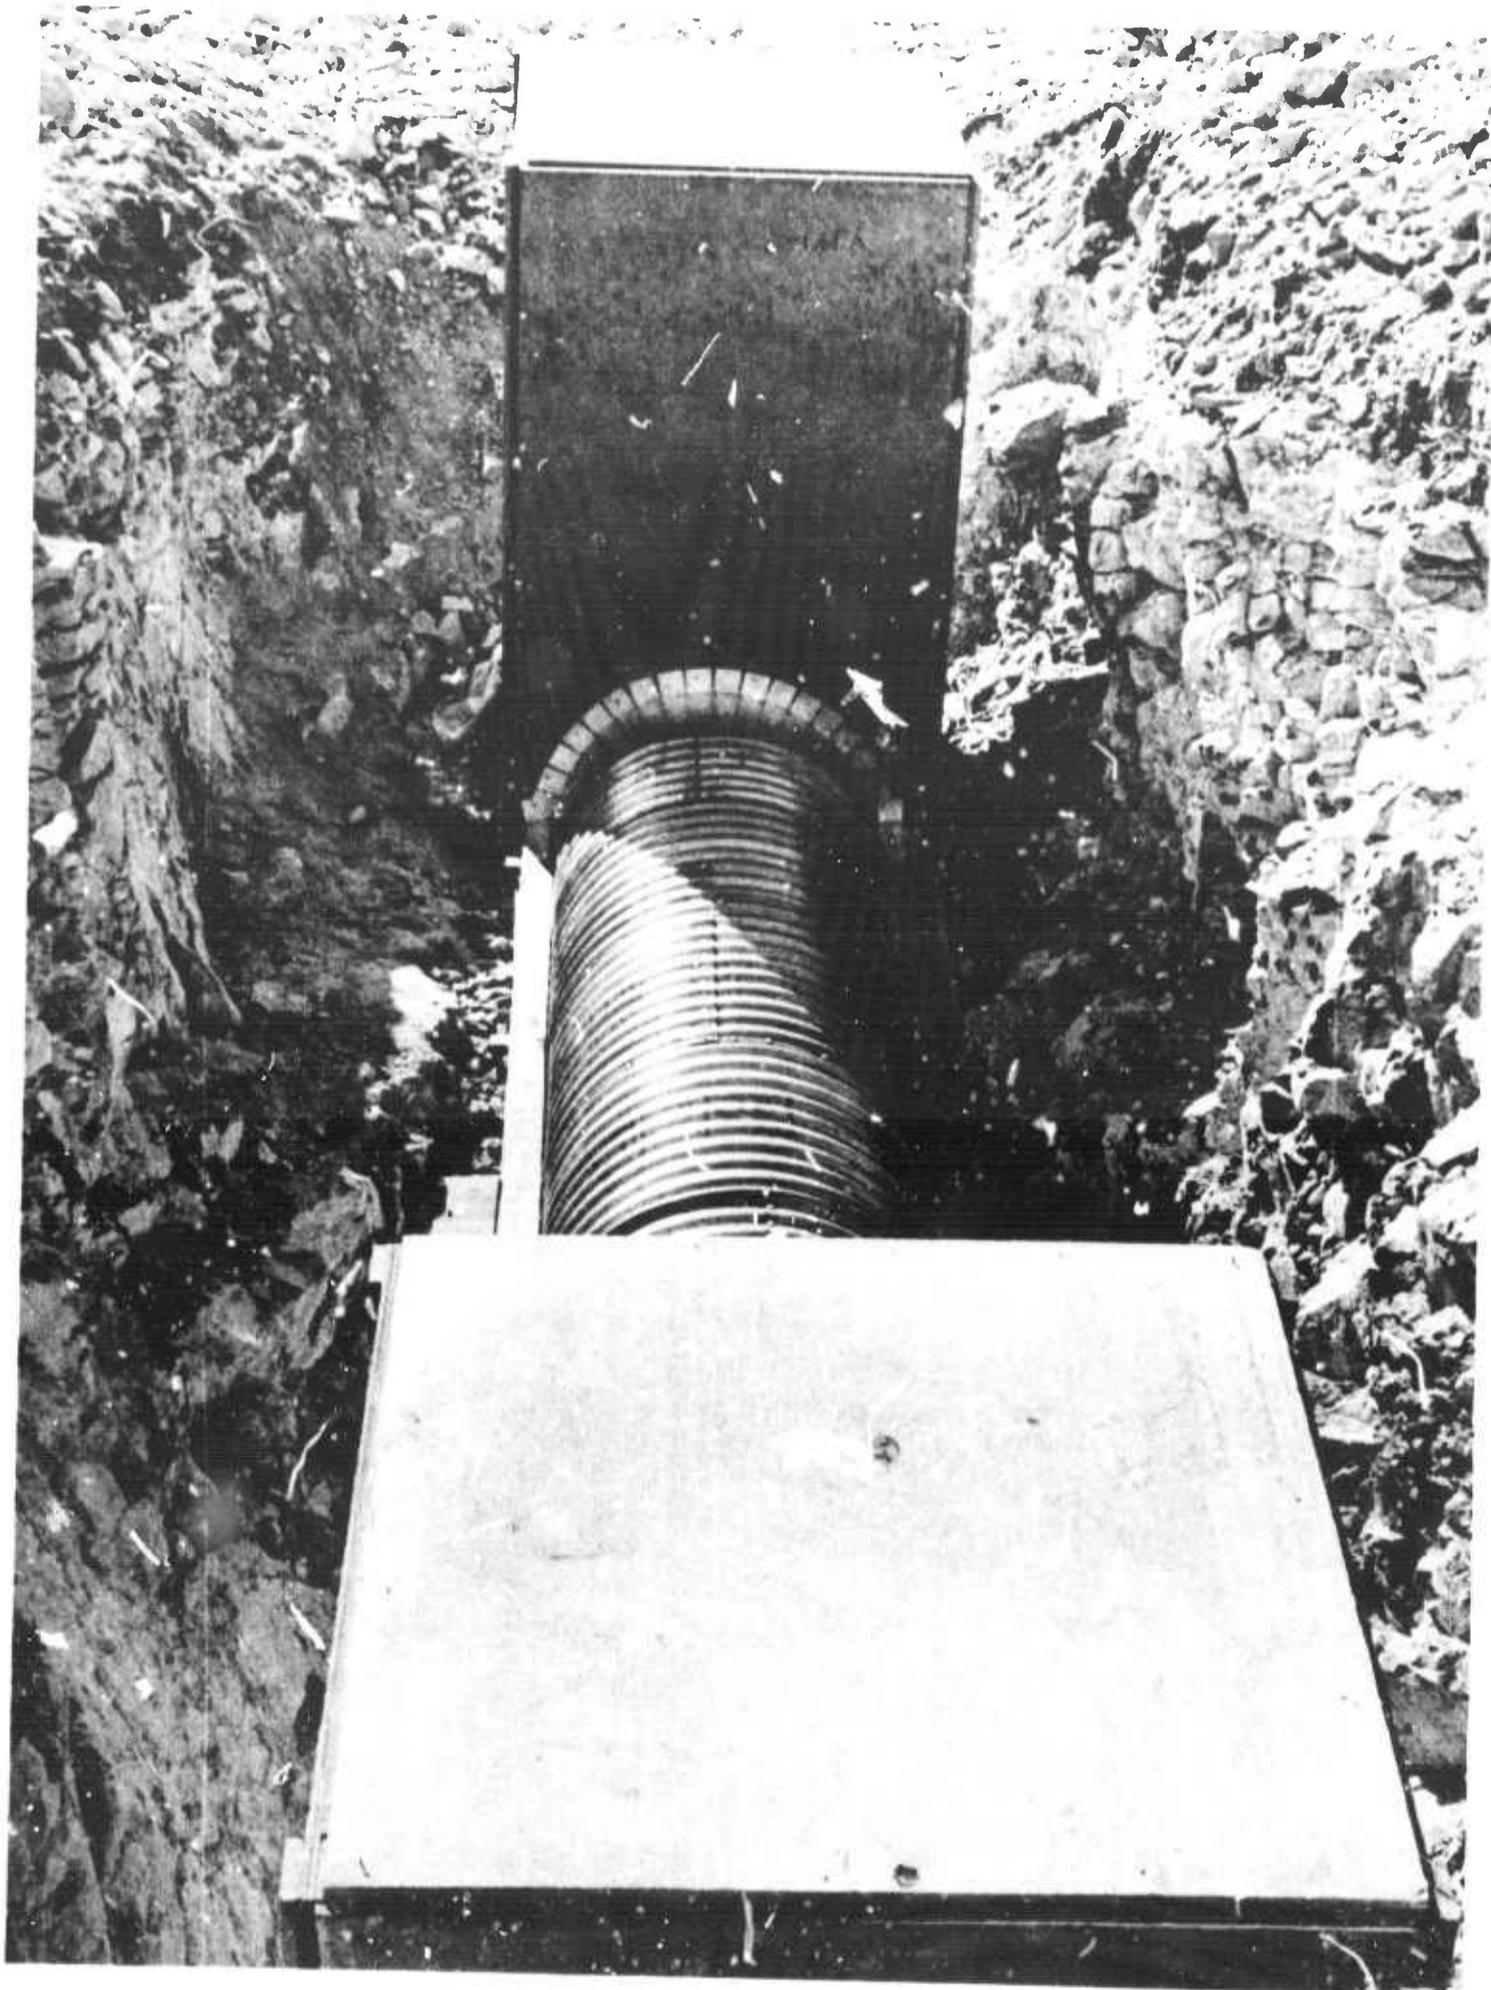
View of the trench installation at Site No. 5 (YM-NV) taken just prior to backfilling the trench.
